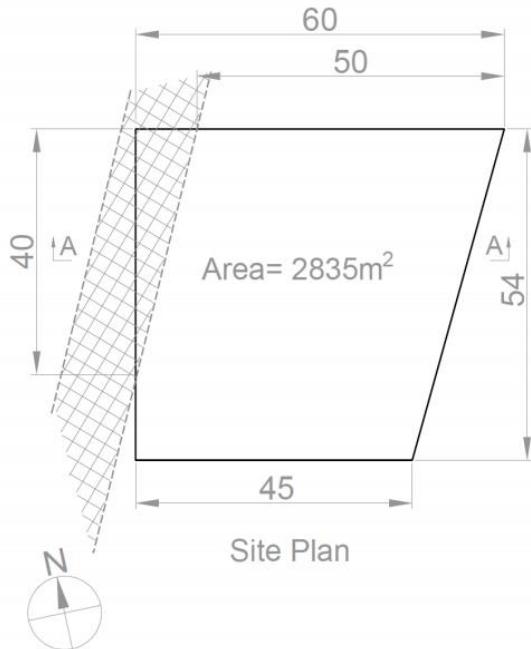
Site Plan requirement. Retrieved from SIMPLE MULTI-STOREY BUILDING DESIGN coursework by Louca, 2022.
